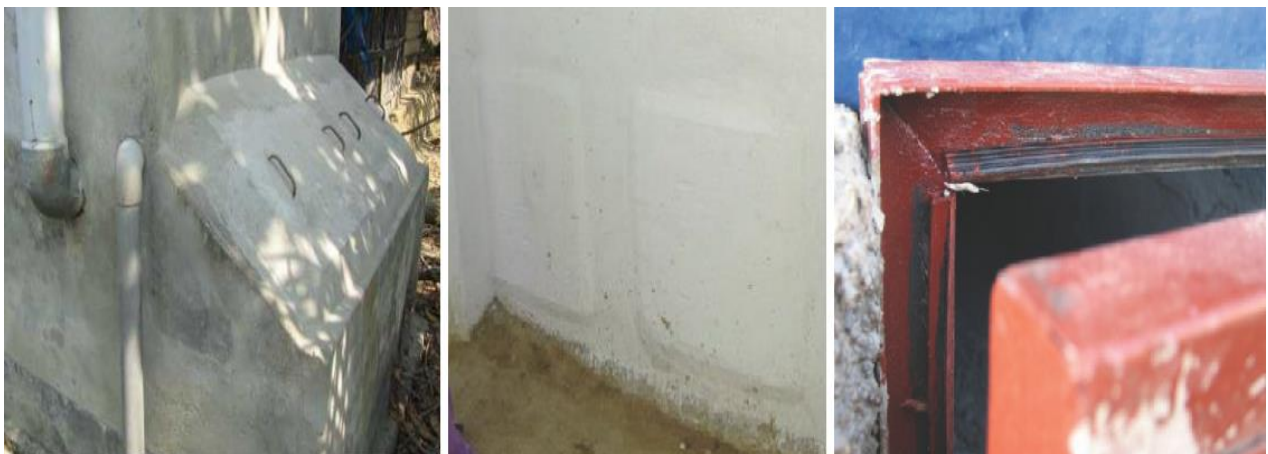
Semi-permanent vault doors made of concrete with metal handles (left) (Delepiere, 2011, p. 4, adapted); Semi-permanent brick and mortar vault doors (centre) (Rieck et al., 2012, p. 19, adapted); Rubber-sealed vault door to promote air-tight conditions (right) (WECF, 2015, p. 29, adapted).
